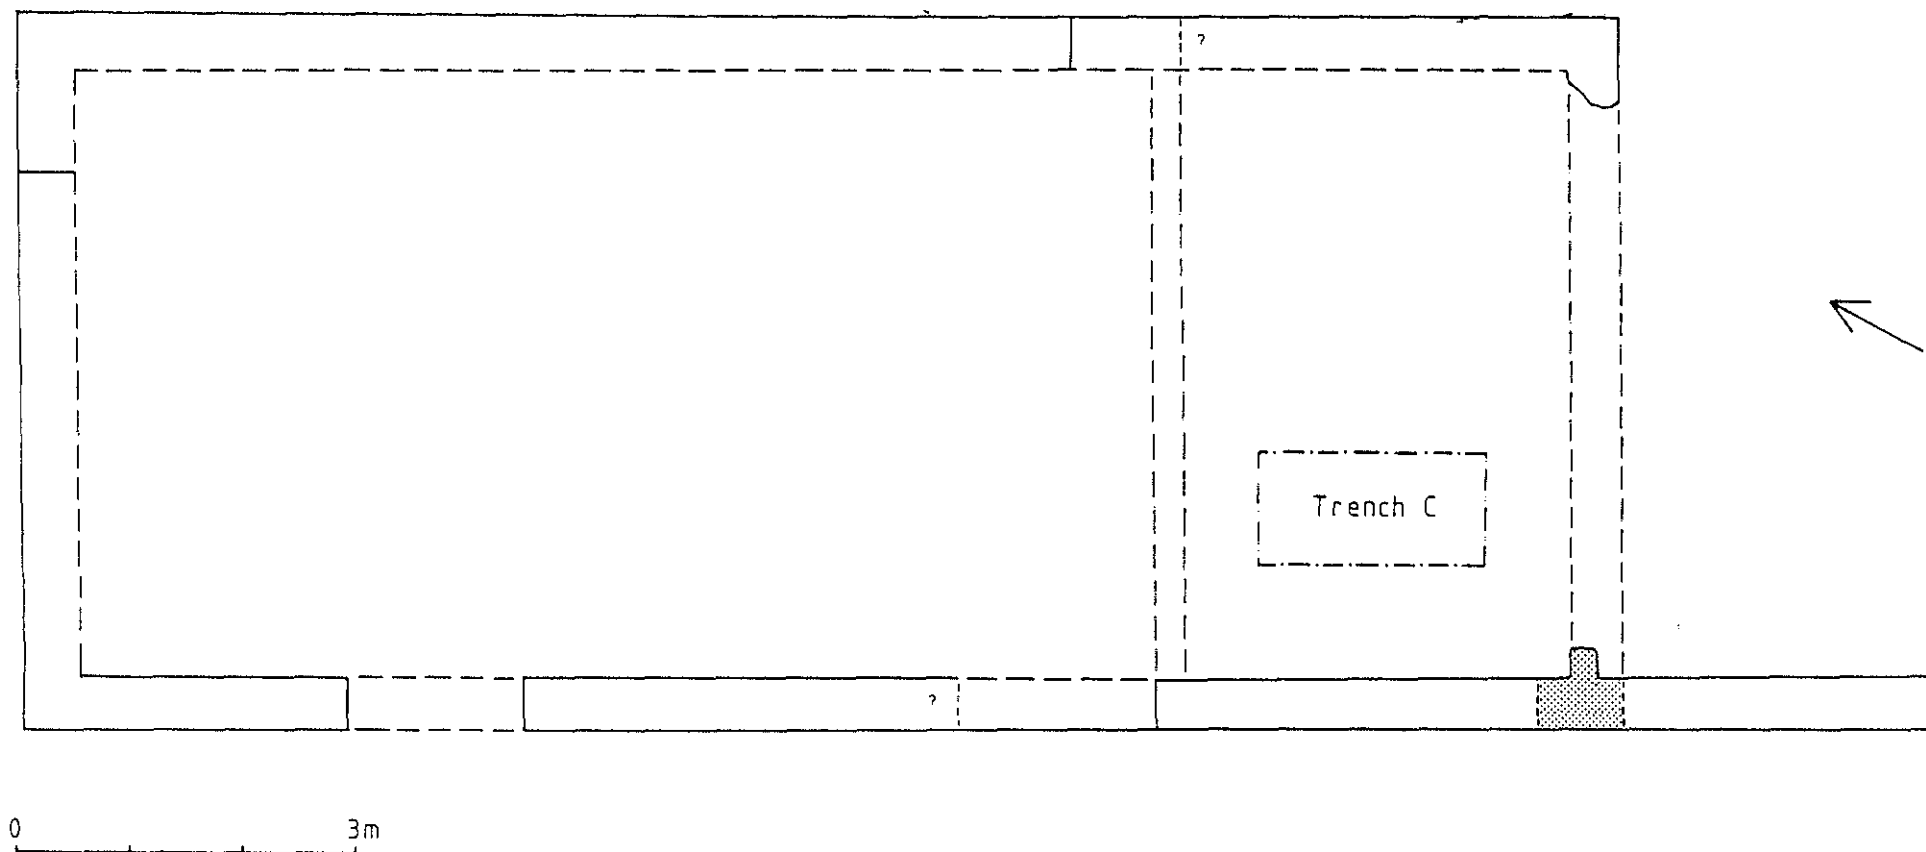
Plan of the Ruin (Structure 5) at Ship Farm showing the location of trench C.
